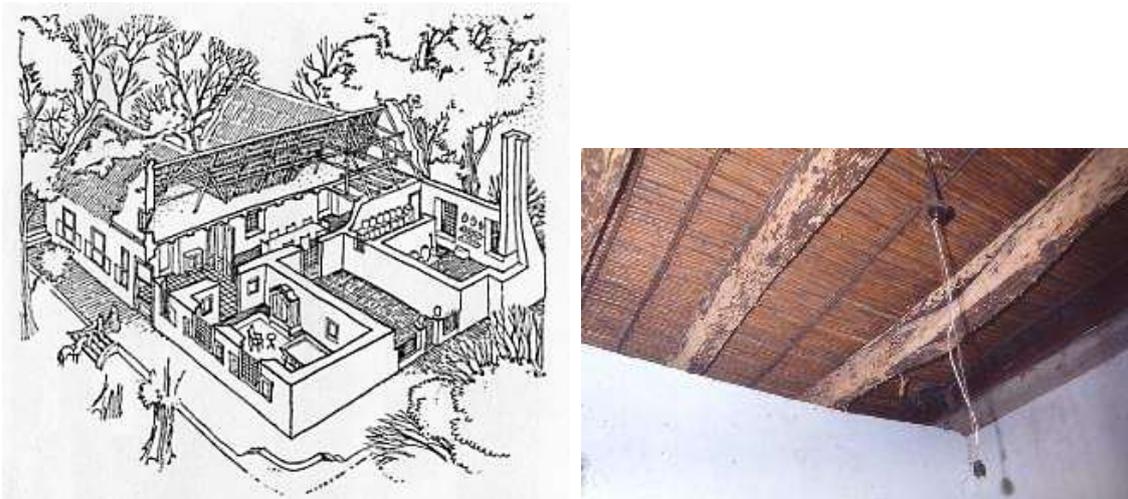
Left: Biermann's sketch showing the spatial and constructional layout of the traditional Cape house (Biermann, 1995:37). Right: Timber tie beams of roof truss supporting floor of roof space (Fagan, 2012).
